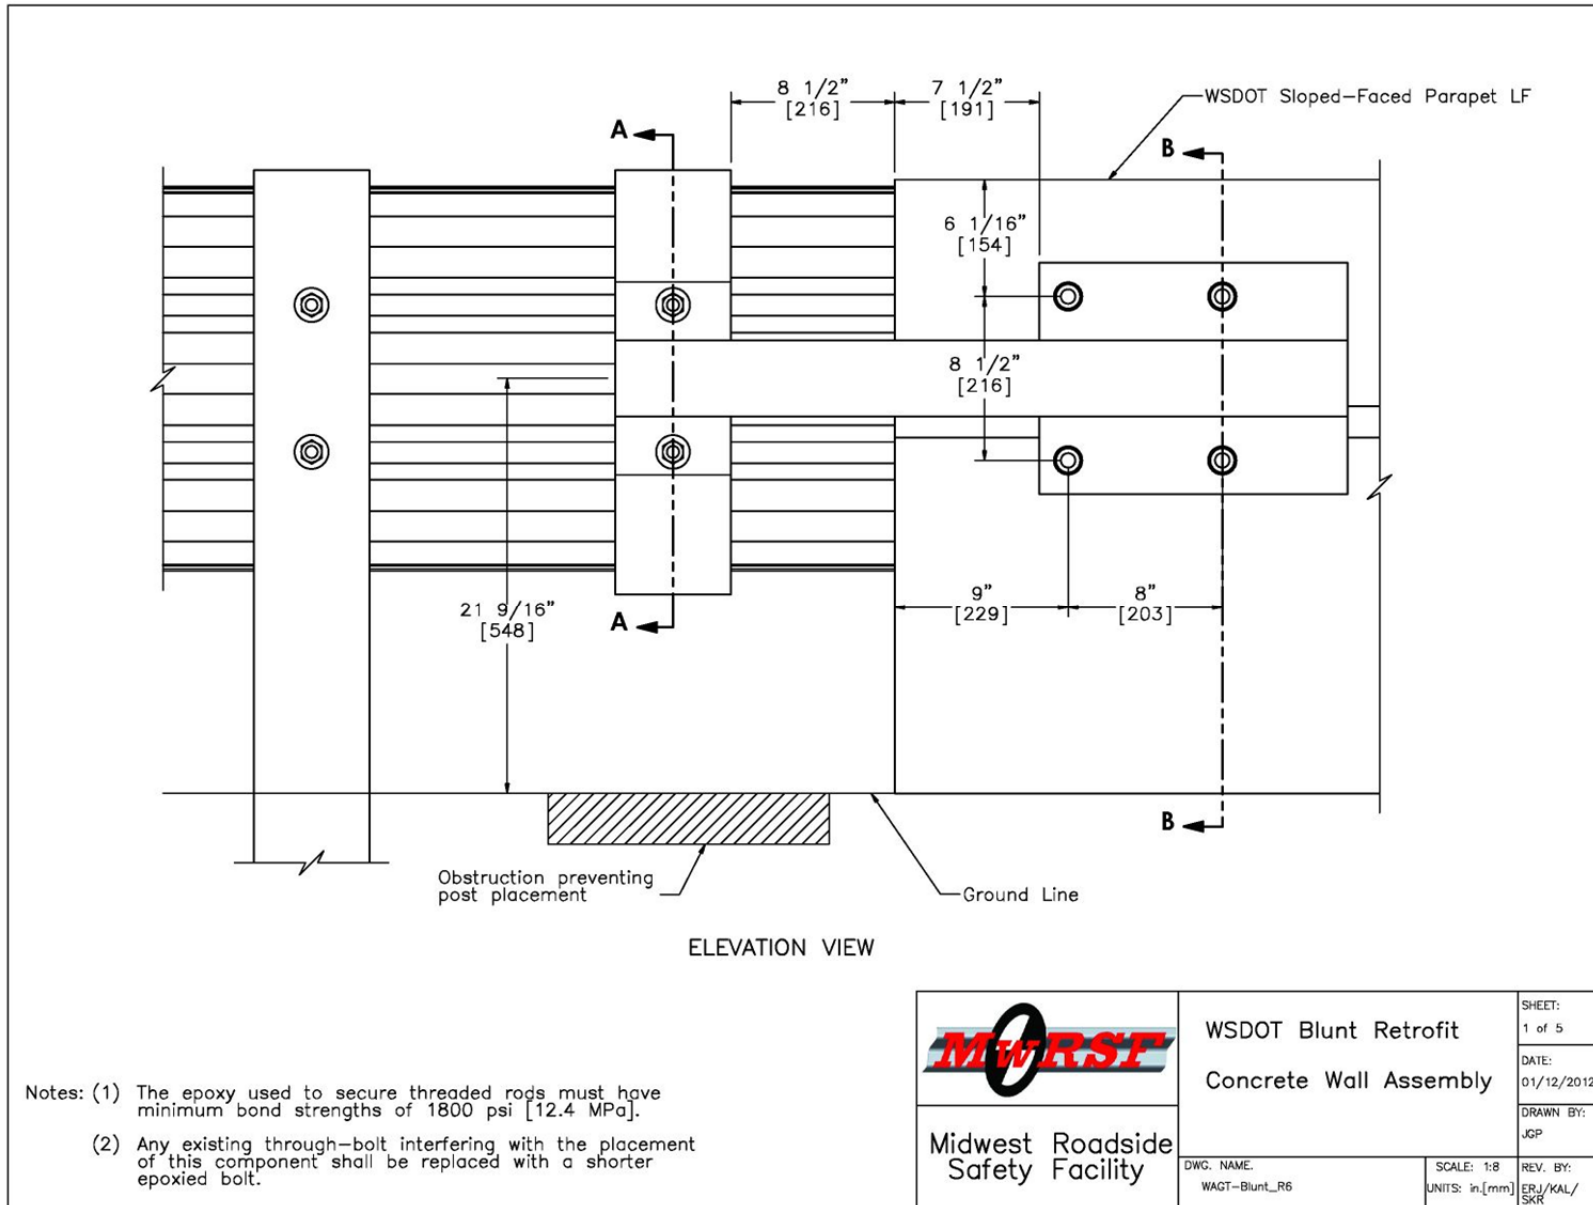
Retrofit 2 – Blunt-End Concrete Wall Assembly – Back View
